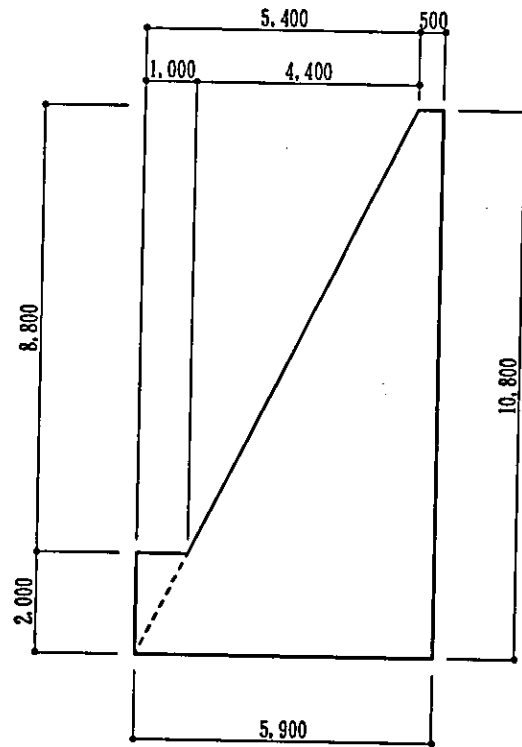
DIMENSIONS OF DOWNSTREAM WING WALL
